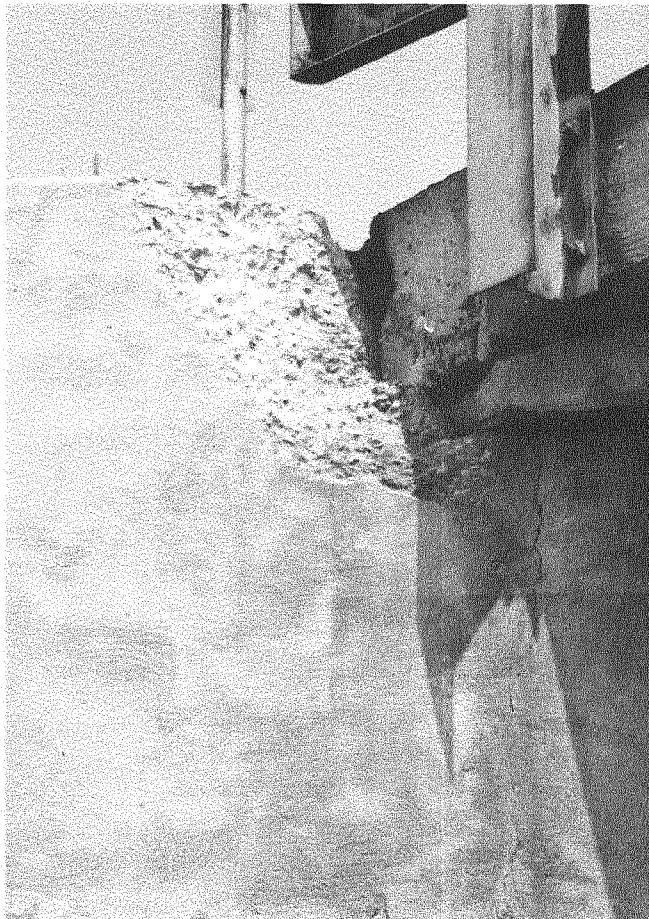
An abutment headwall showing minor cracking
